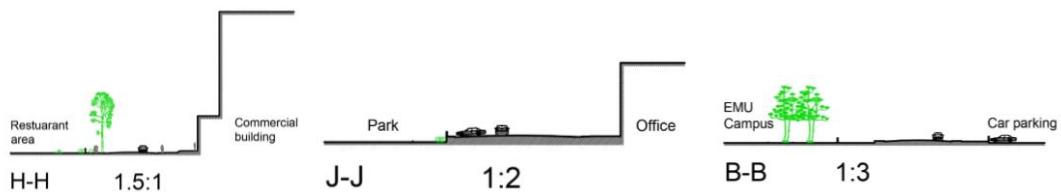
Inappropriate building heights and lack of buildings damage sense of enclosure in street
